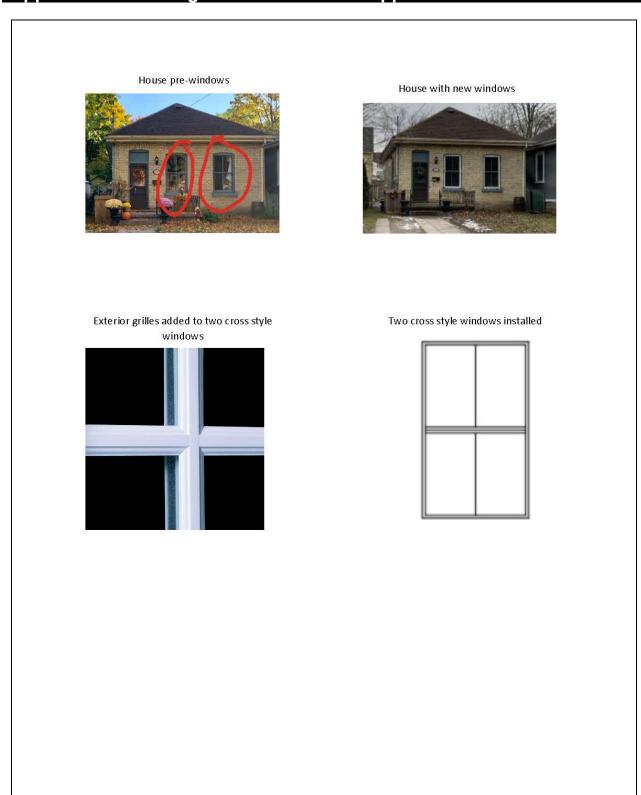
Details submitted as part of the Heritage Alteration Permit application showing the proposed exterior grilles for the replacement windows.
